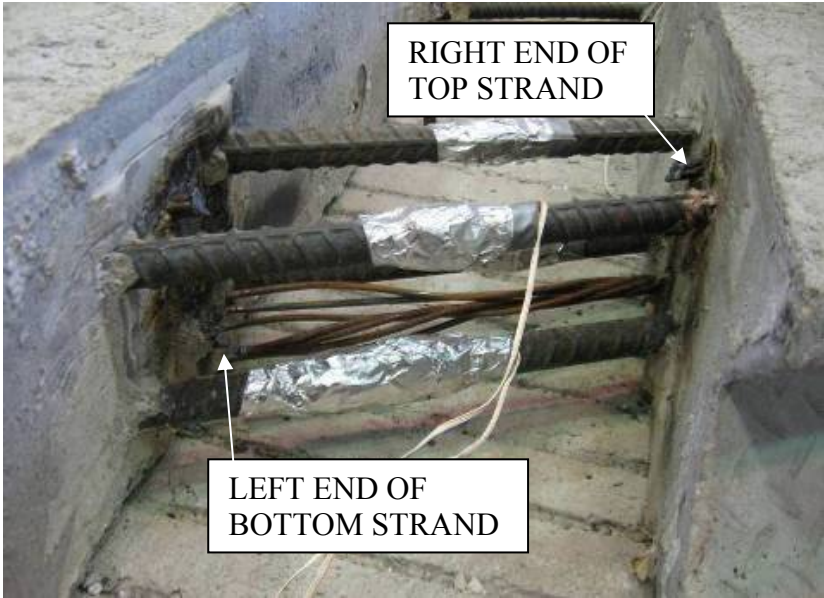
Reinforcing bars instrumented with steel strain gages
